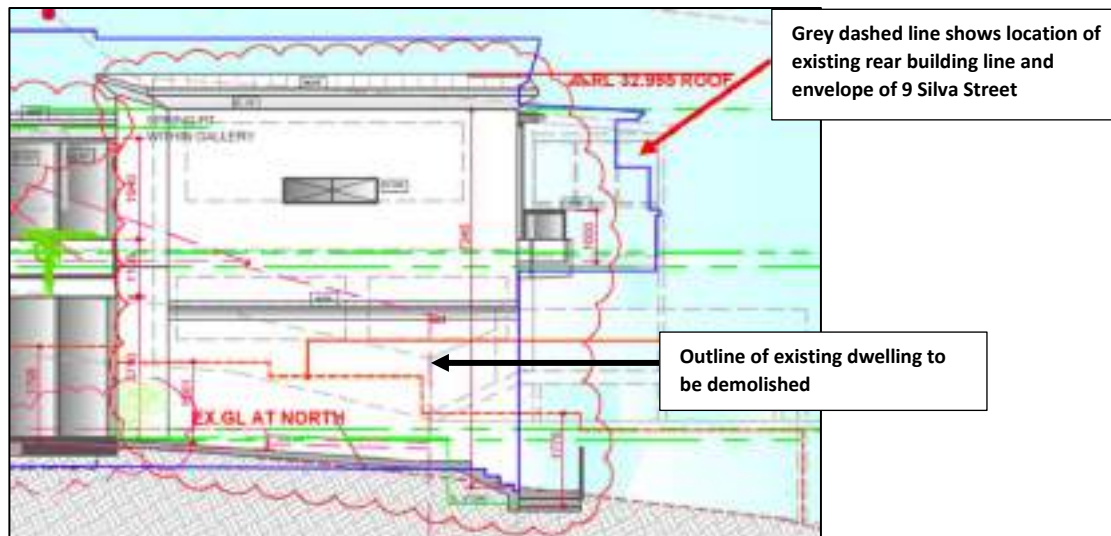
Proposed northern elevation showing rear building setback and location of rear balcony compared to existing rear building line and balcony at 9 Silva Street.
